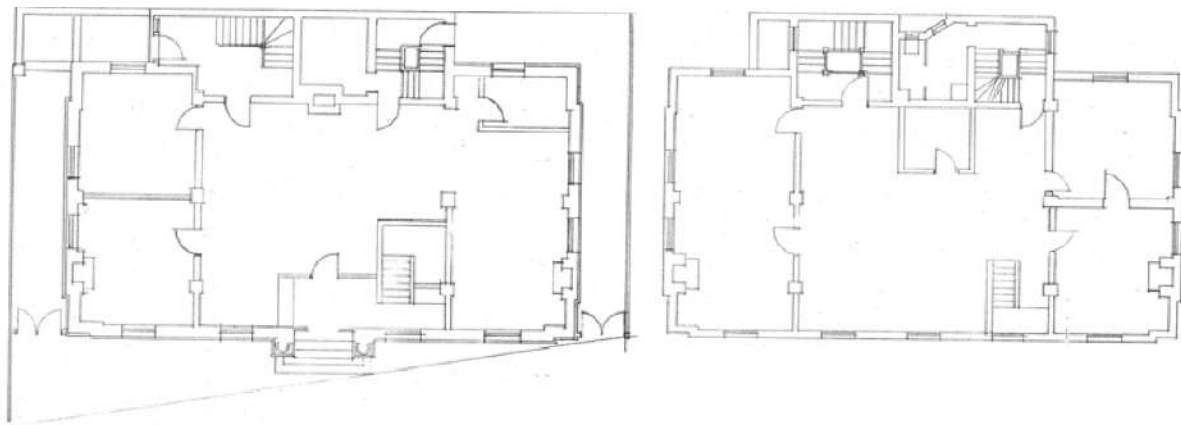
Ground floor plan (left) and first floor plan (right) of the Bureau of Meteorology, circa 1962. (Source: TKD 2016: Fig 41).
